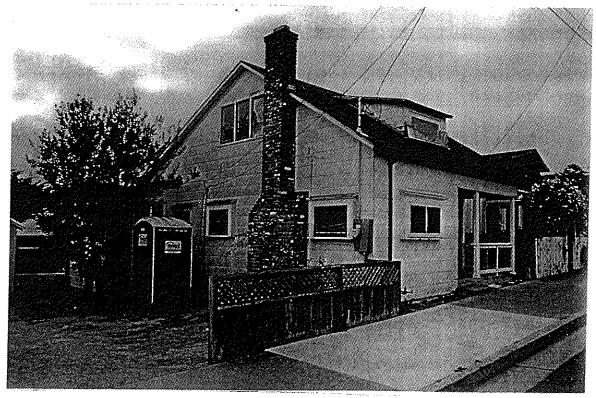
Looking SE at the north side & front elevations. August, 2014.
